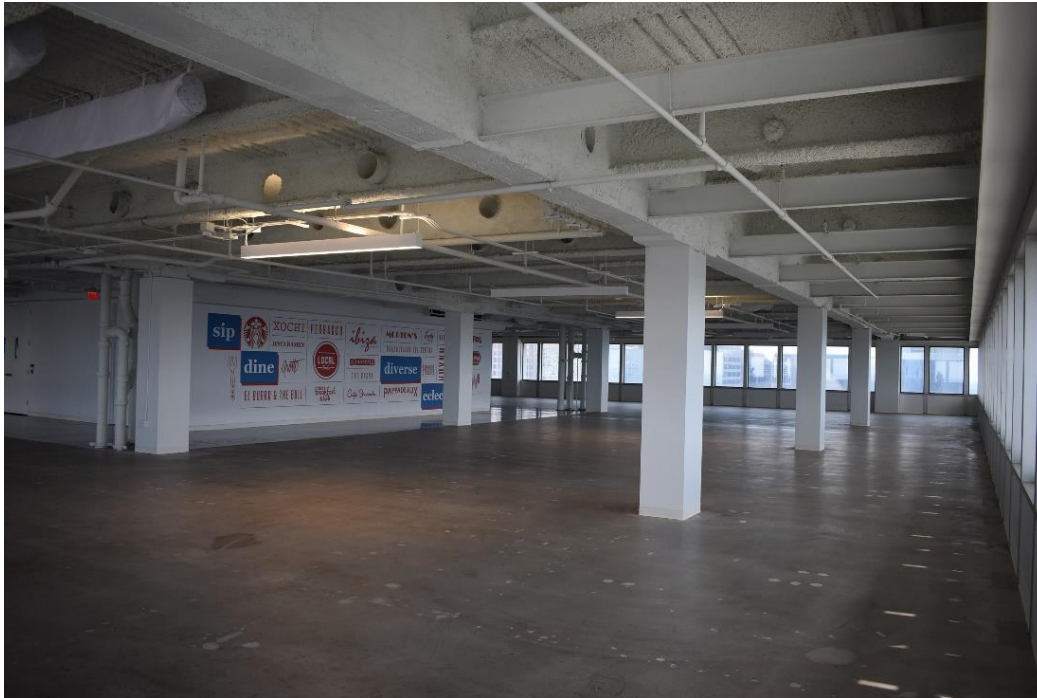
(TX_HarrisCounty_HumbleExxonBuilding_0022)
